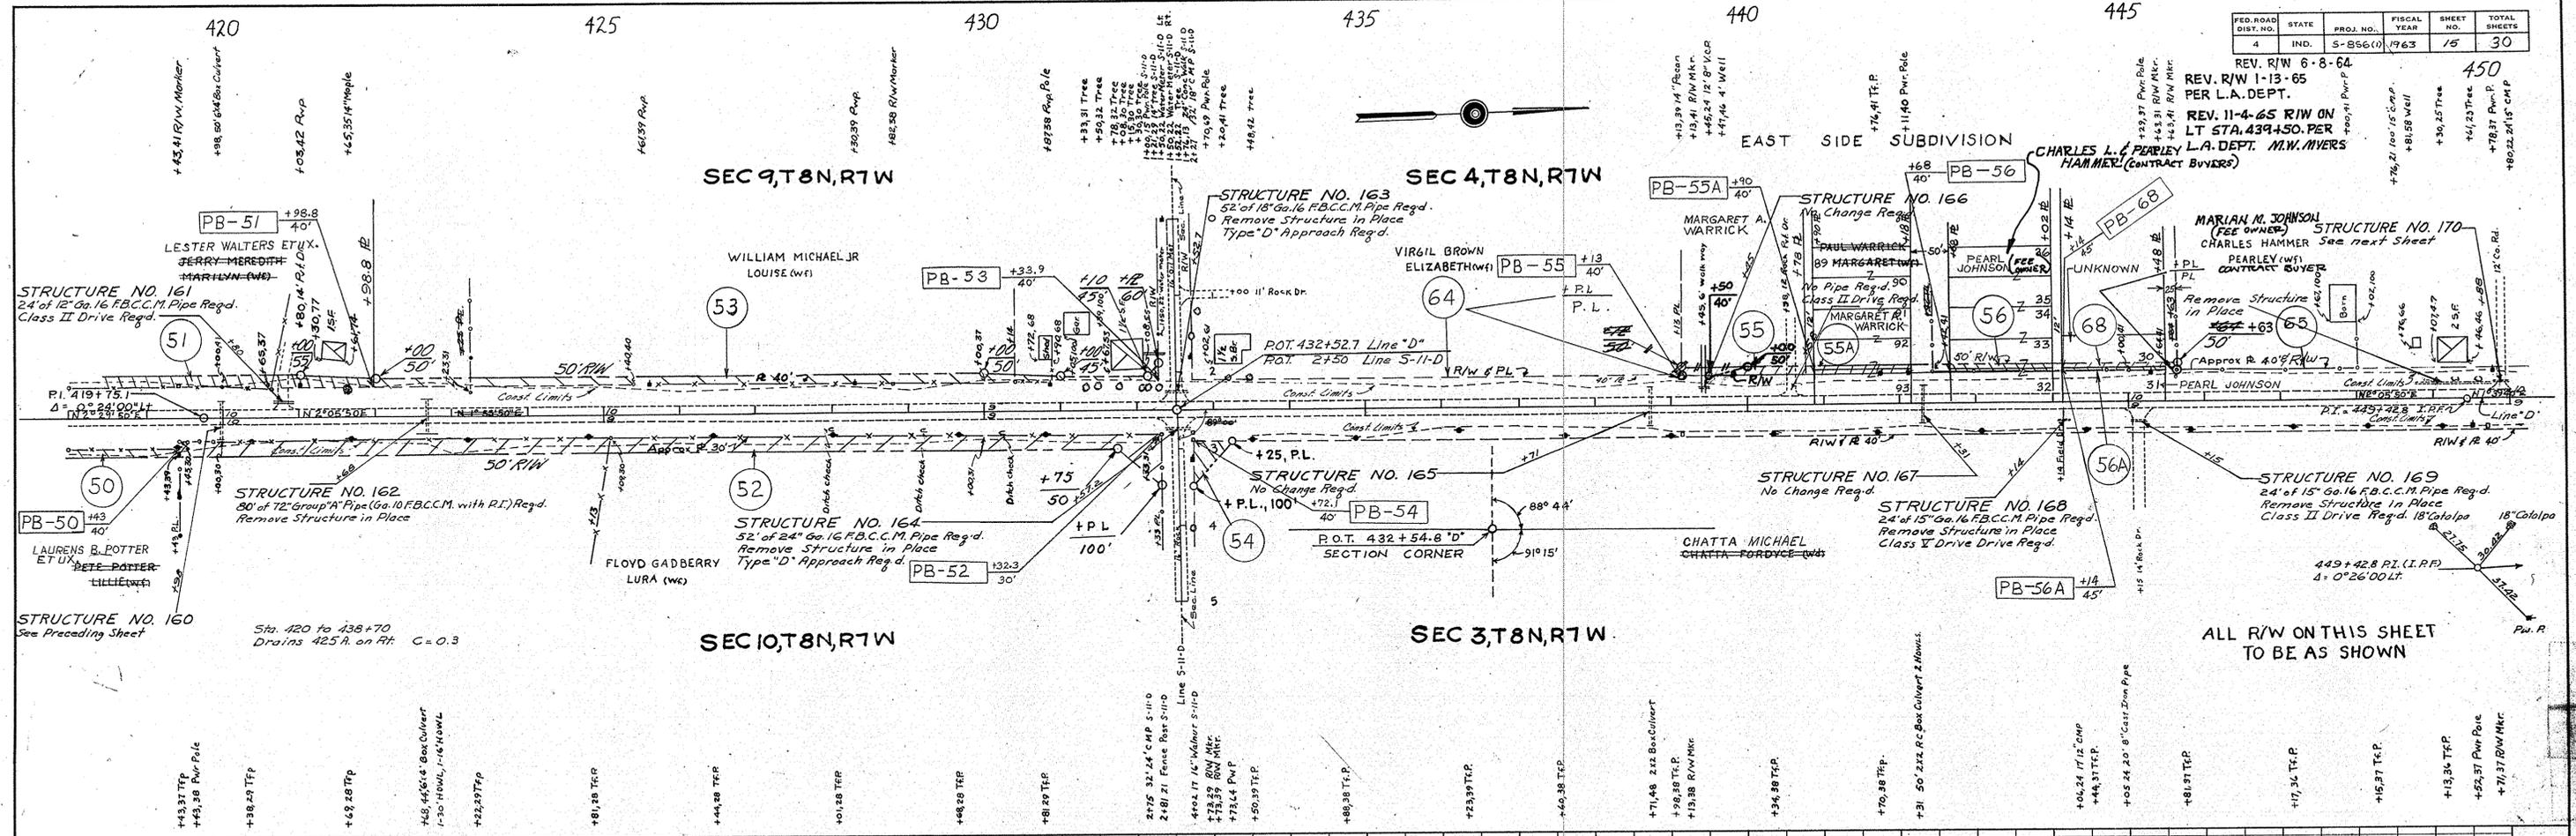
PLAN - PROFILE S. R. STANDARD
